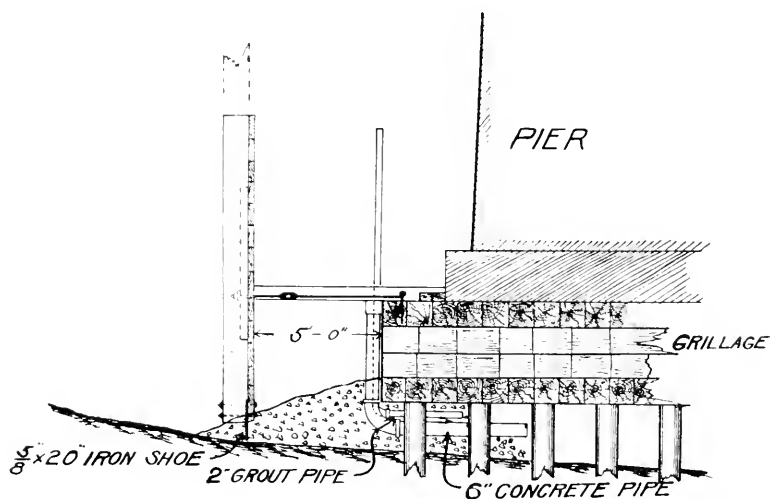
SECTION OF PIER SHOWING RIP RAP AND GROUT PIPES.
